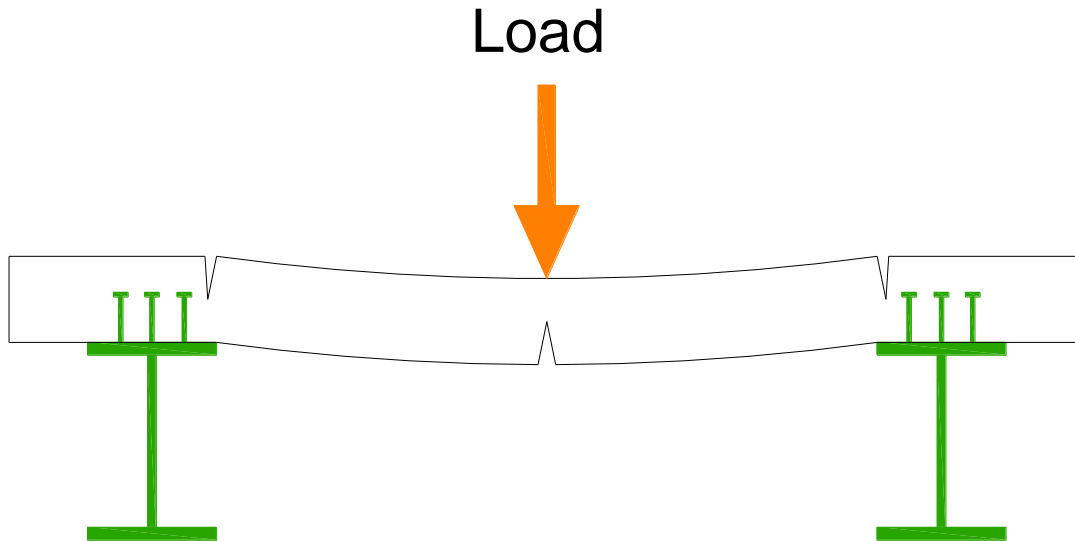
Longitudinal cracking in a flexural designed bridge deck slab under concentrated load
